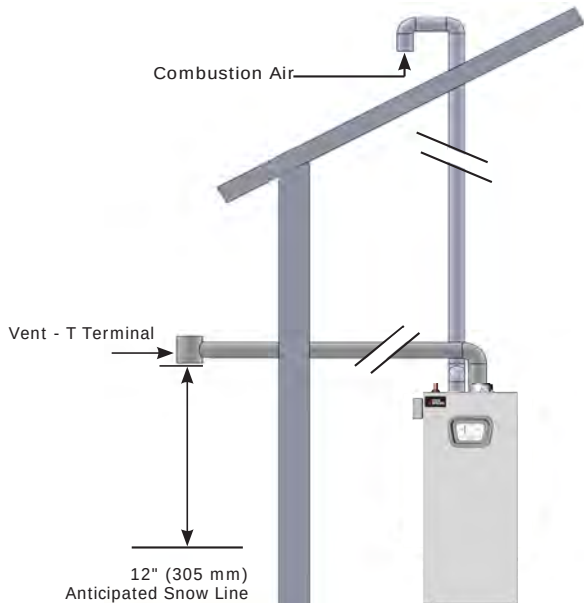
(2" / 60 mm & 3" / 80 mm) Twin Pipe Roof Vent CAN BE USED ON ALL SIZES
